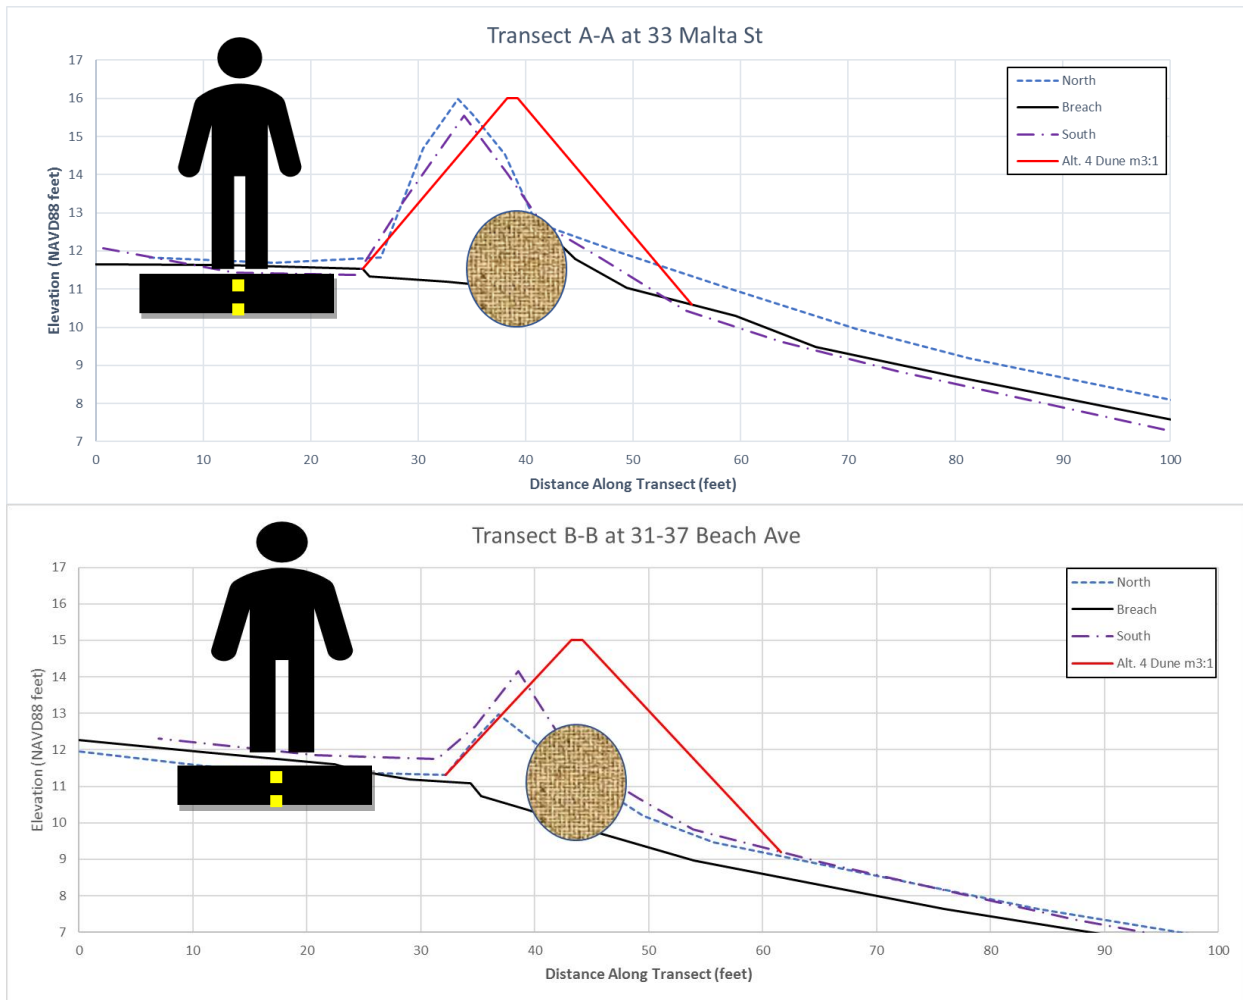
Alternative 4: Constructing a 3H:1V side slope dune (red) to elevation 15 ft-NAVD with a bioengineered core in comparison to adjacent unaltered sections at Transect A-A (Top) and B-B (Bottom).
